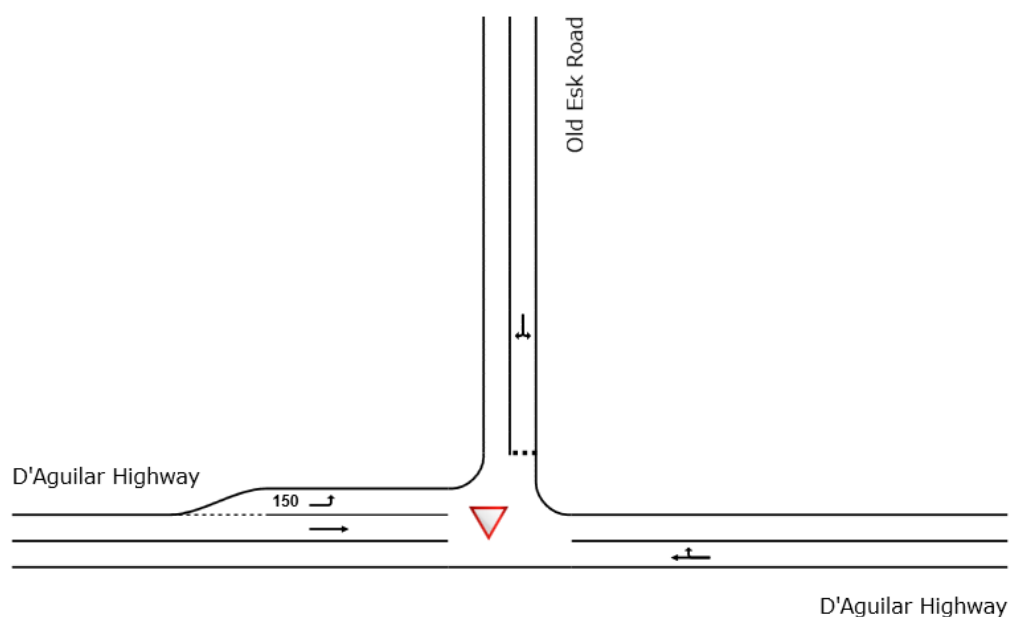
D'Aguilar Highway / Old Esk Road SIDRA layout
